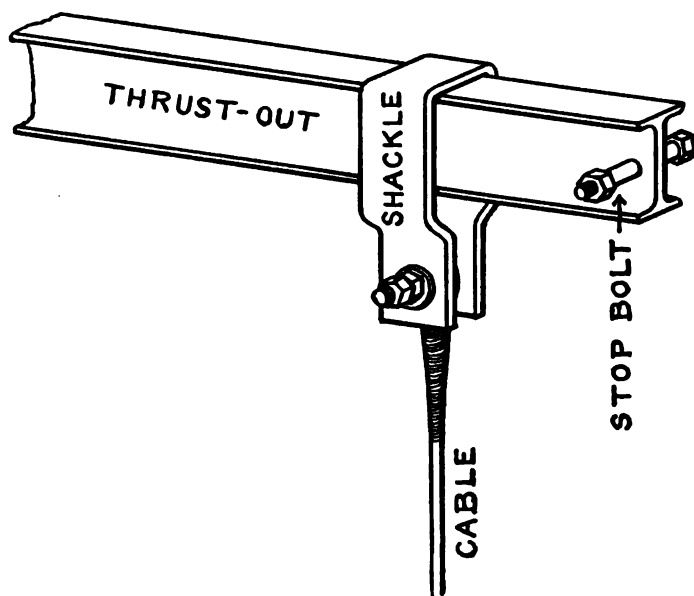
ATTACHMENT OF THE CABLE TO THE THRUST-OUT.
